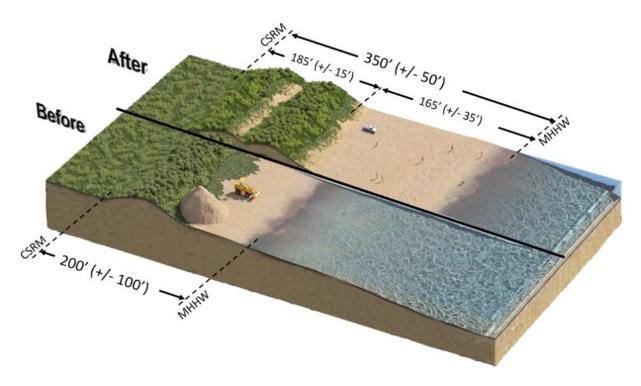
3D Representation of existing profile and tentatively selected plan with general beach dimensions
